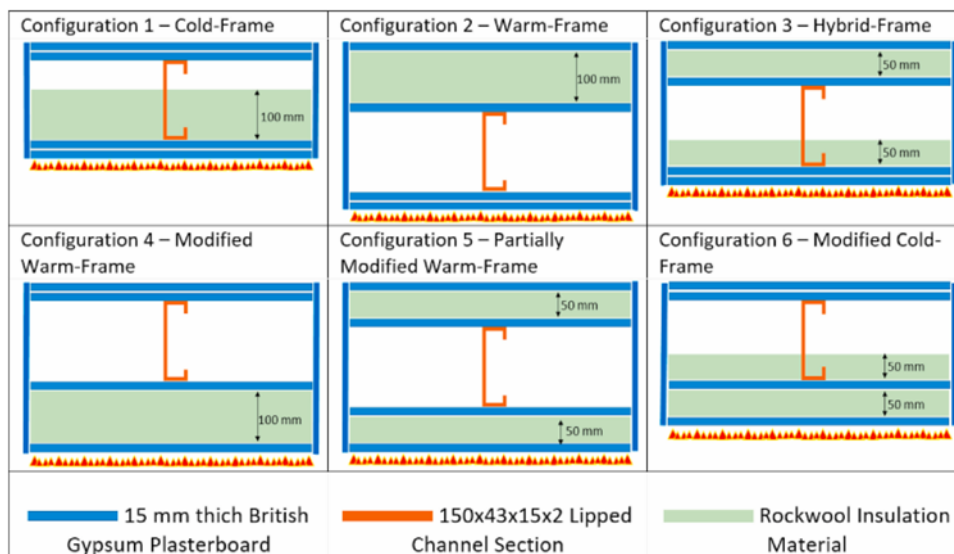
LSF wall configurations studied by Perera et al. [69] (original figure from [69]).
